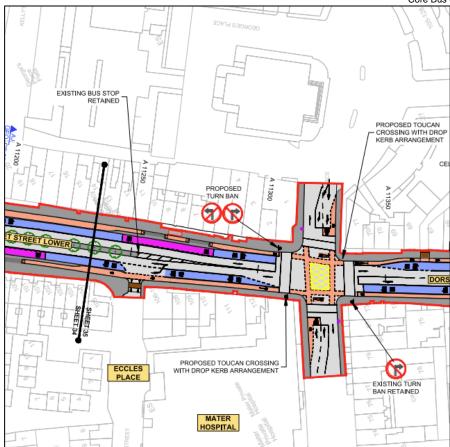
Extract from General Arrangement Drawing (Sheet 35)
